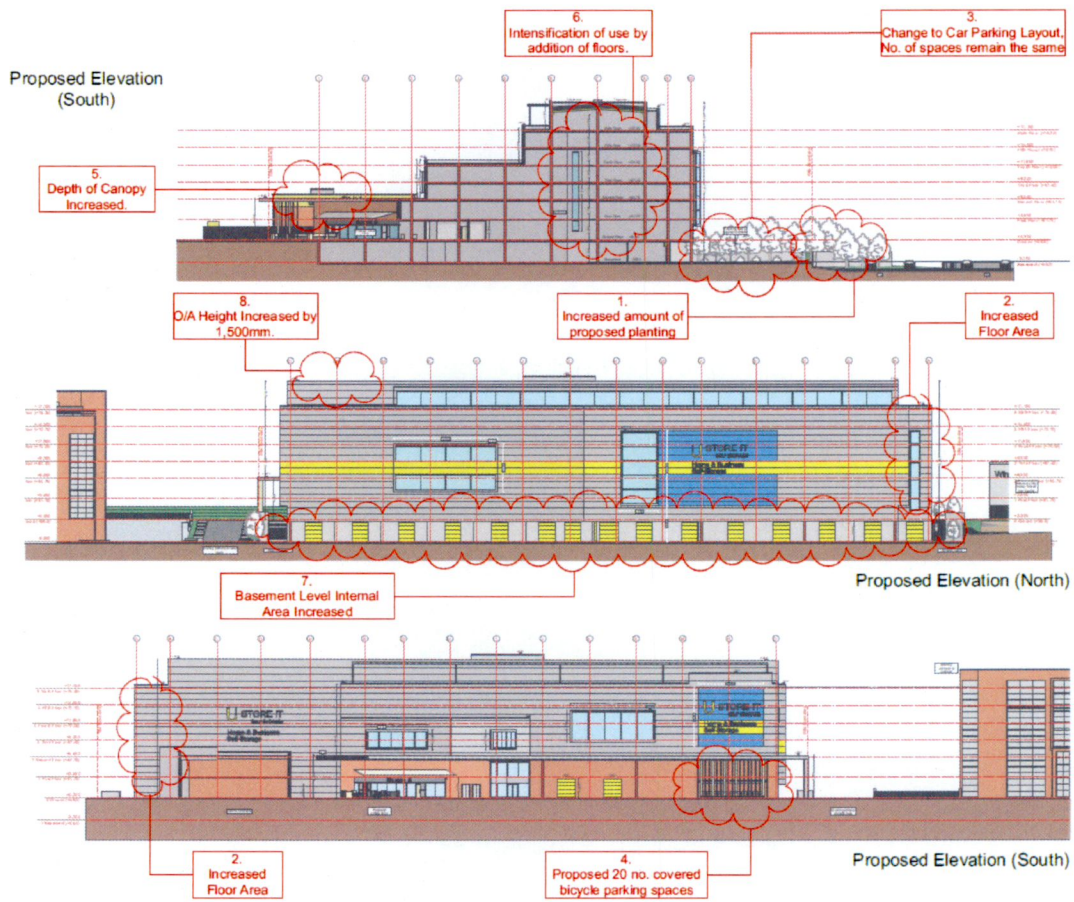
Proposed Elevations (Source: Carew Kelly Architects, October 2022)
